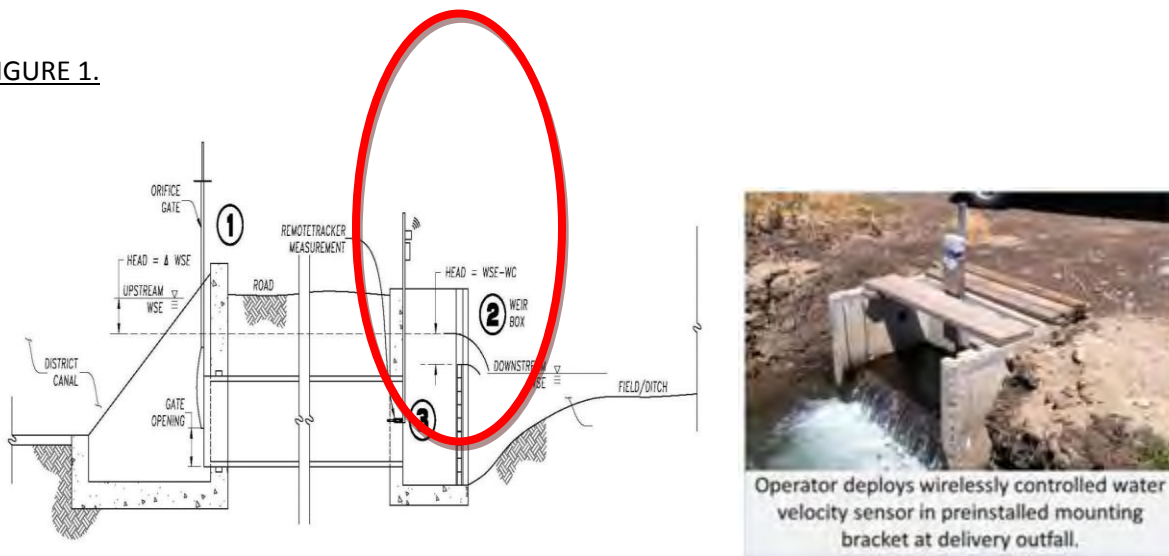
Typical field turnout with addition of concrete weir box shown in the oval. Photo to the right shows the portable Doppler meter installed in the proposed concrete weir box.
